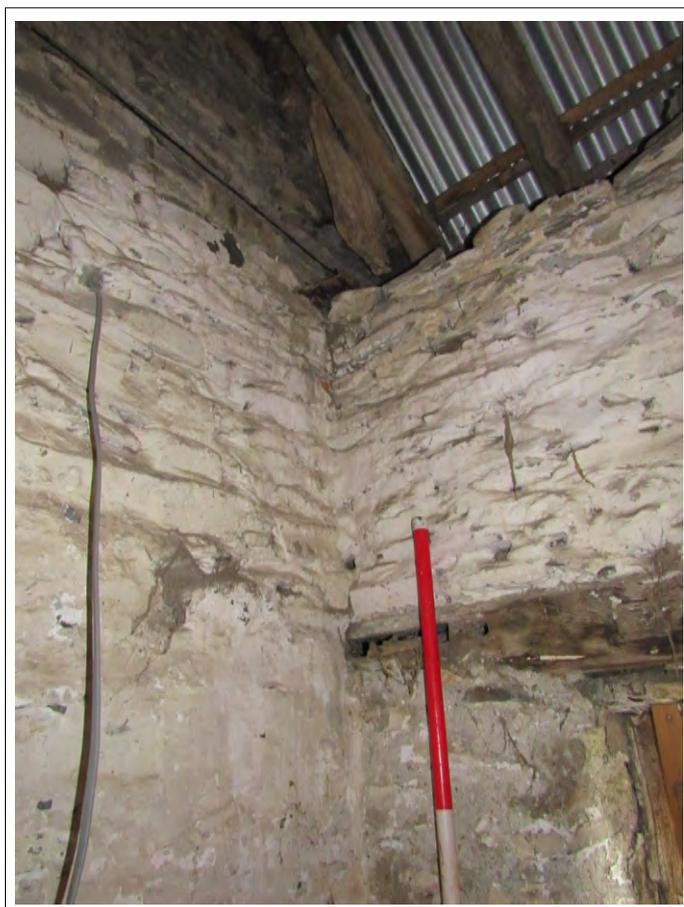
Barn interior, join of barn SE wall and SW wall of house. View E. 2m scale
